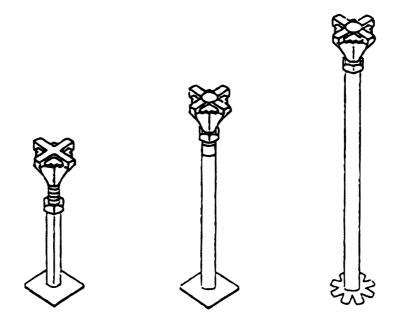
TYPICAL SECTION OF RAISED FLOOR SYSTEM
